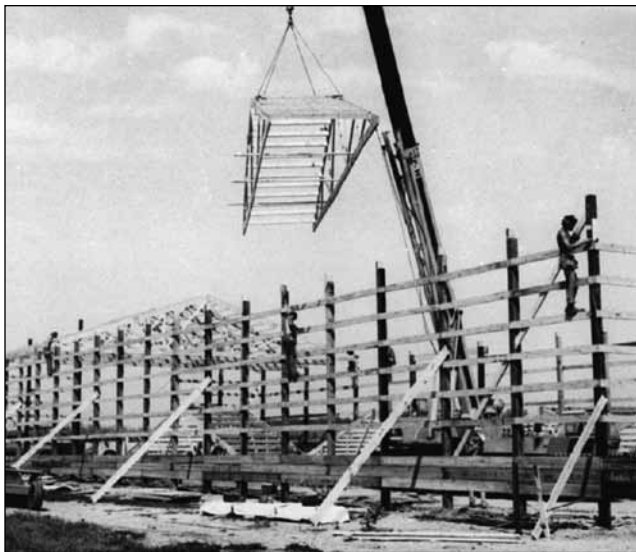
Poles provide economical foundation and wall systems for agricultural and storage buildings.
